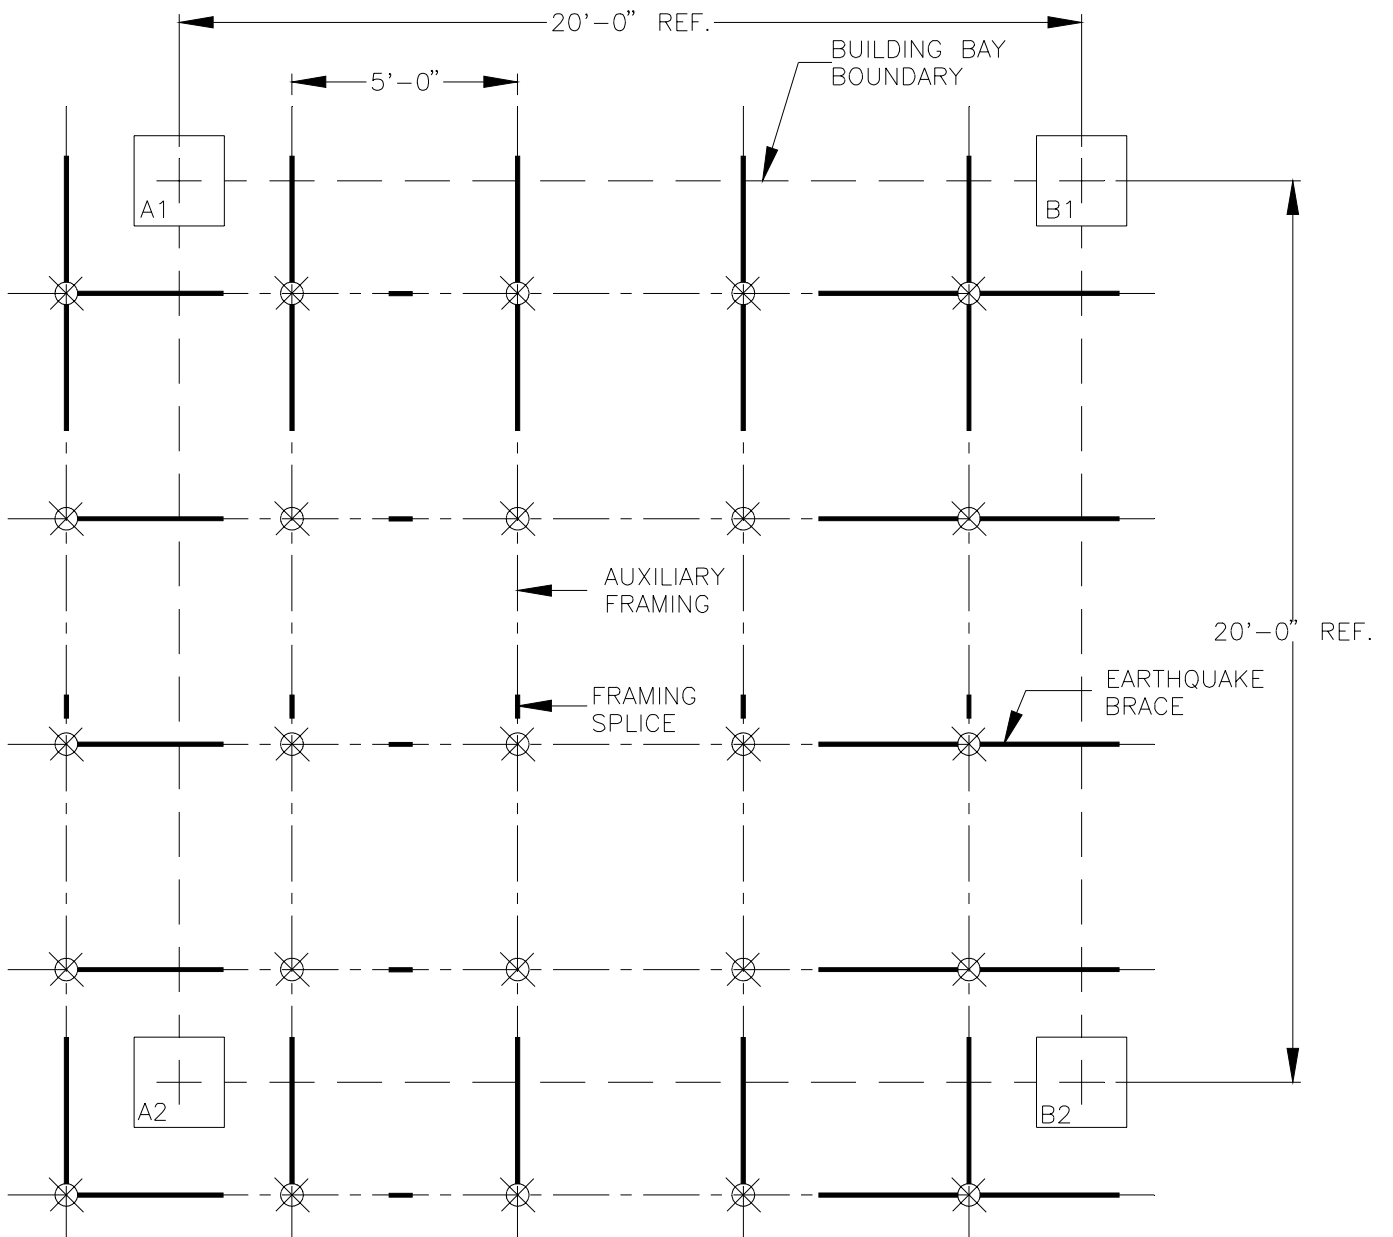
Standard Auxiliary Framing And Bracing Arrangement
